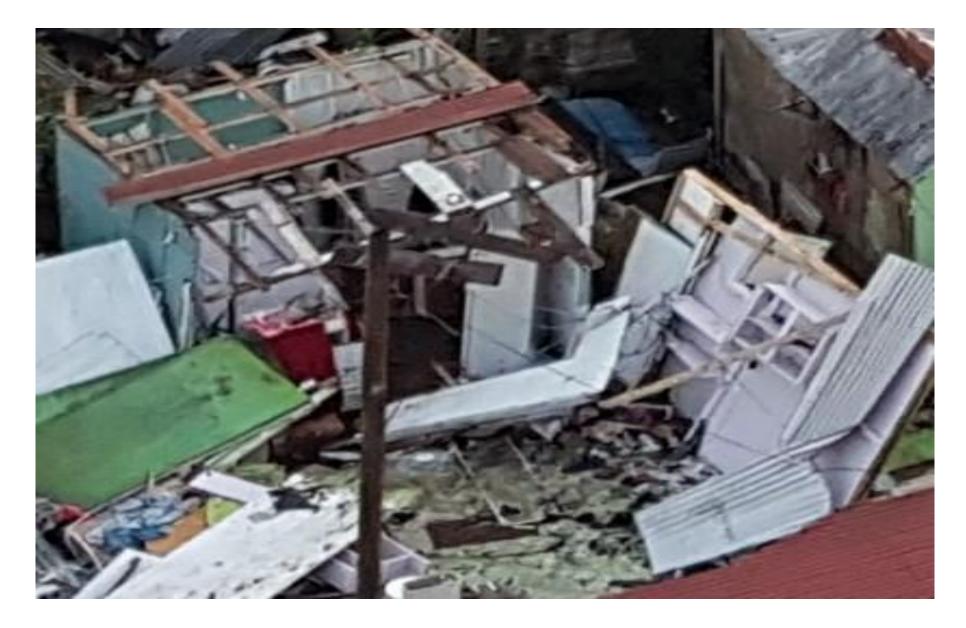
TYPICAL ROOF DAMAGE – FASTENER PULLOUT AND SHEETING TEAROUT
